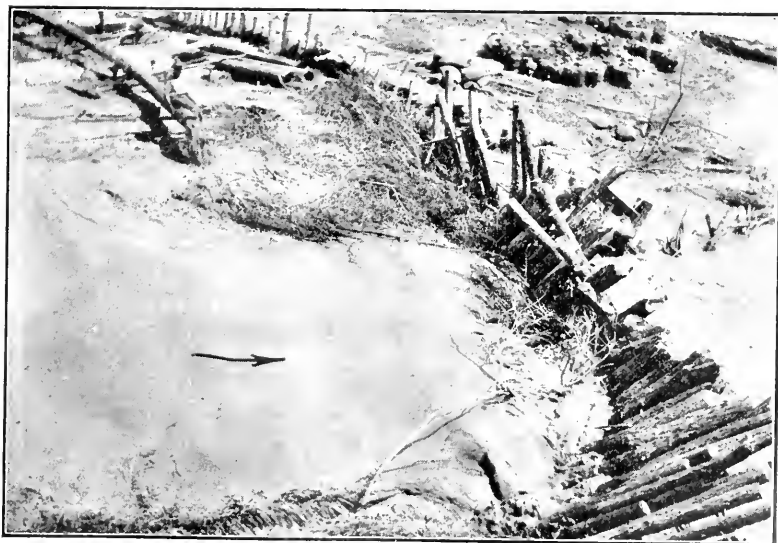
REMAINING OPENING IN HYDRAULIC-FILL DAM, HANLON HEADING, SEPTEMBER 17TH, 1915.
